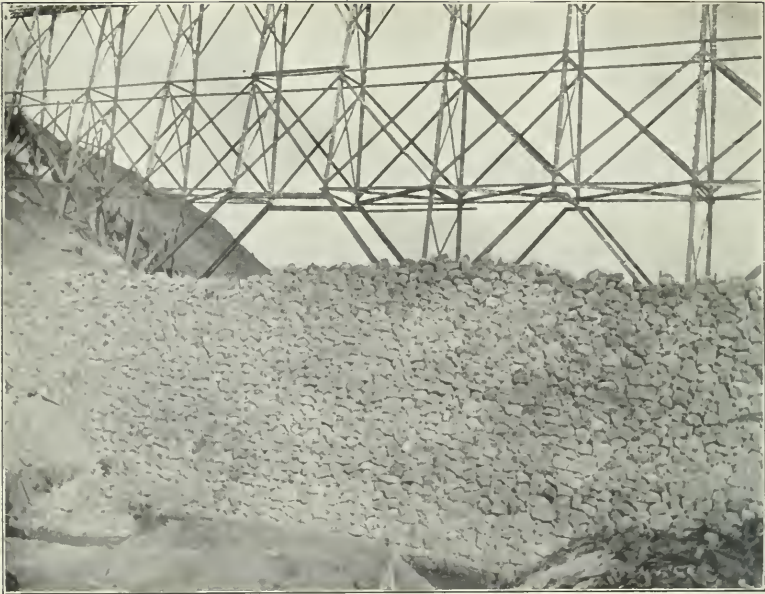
ROCK-FILL ON DOWN-STREAM SIDE OF WAIALUA DAM.
